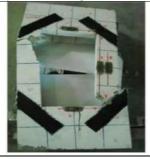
Crack patterns on the tension face after failure of the 40mm thickwall panels with openings strengthened with CFRP pattern 2. [23]
